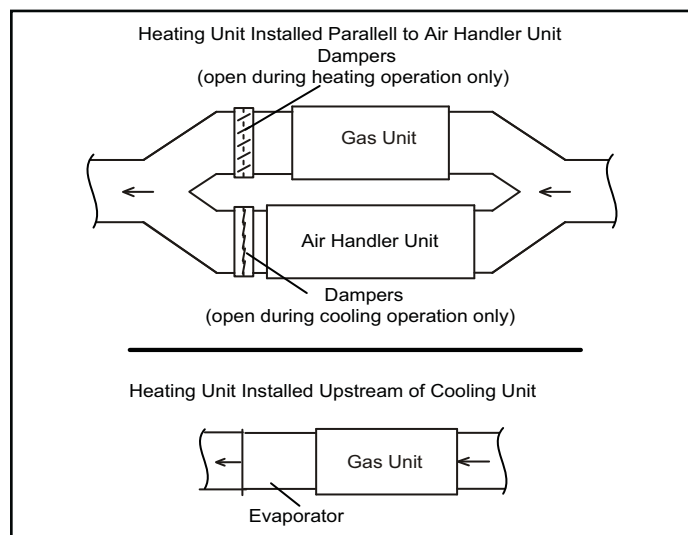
Heating Unit Installed Parallel to Air Handler Unit
